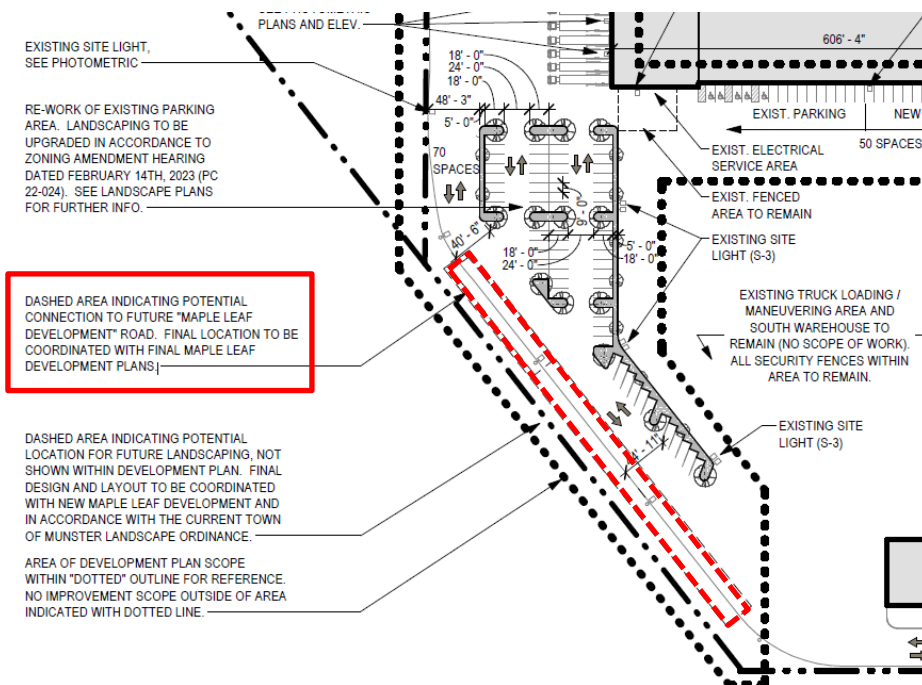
Area reserved for Maple Leaf Boulevard connection.
